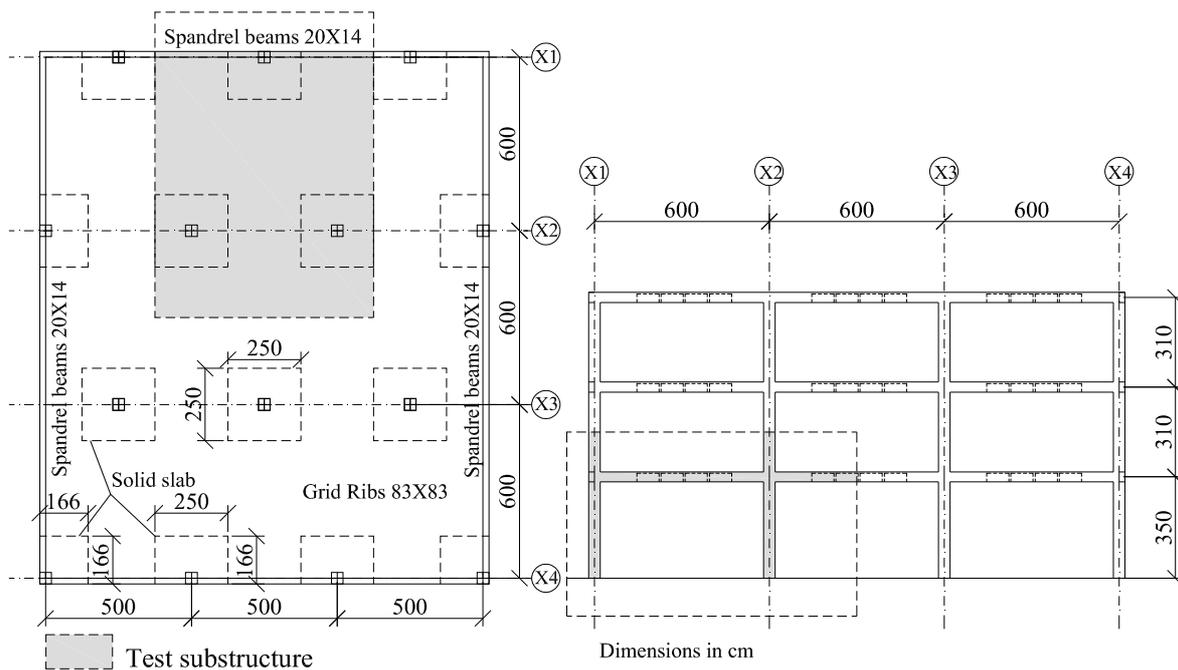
Prototype structure (left: plan; right: elevation in the Y direction)
